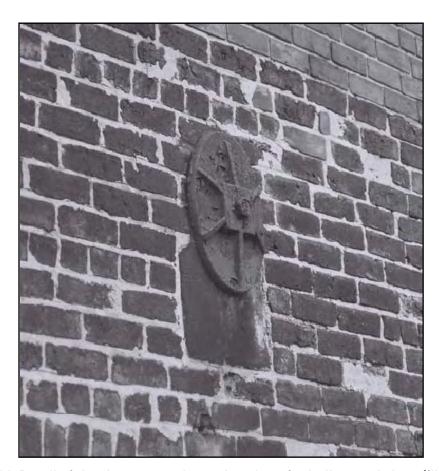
Detail of first floor stringcourse on south elevation of grinding workshop (film 1.27)
